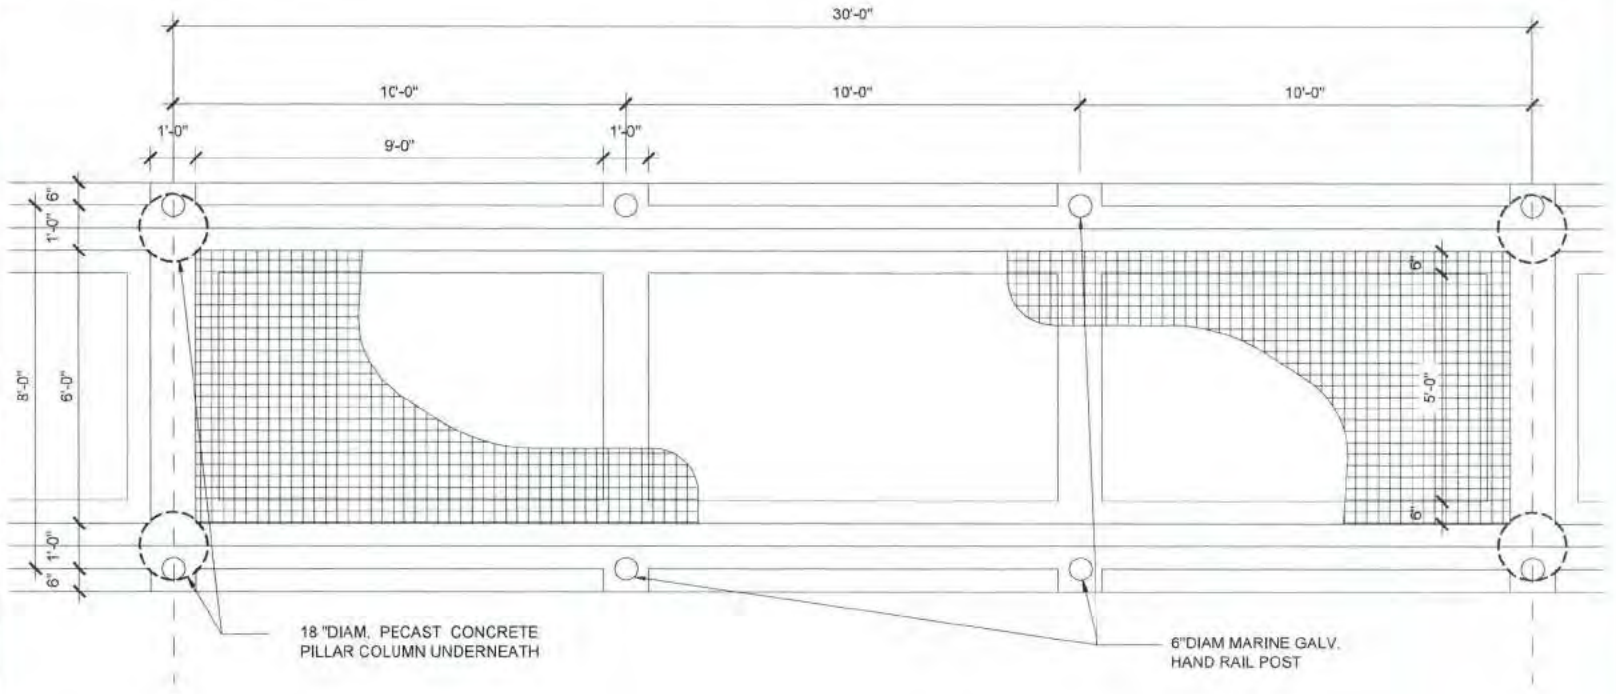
PIER PLAN SEGMENTS (SCHEMATIC)
